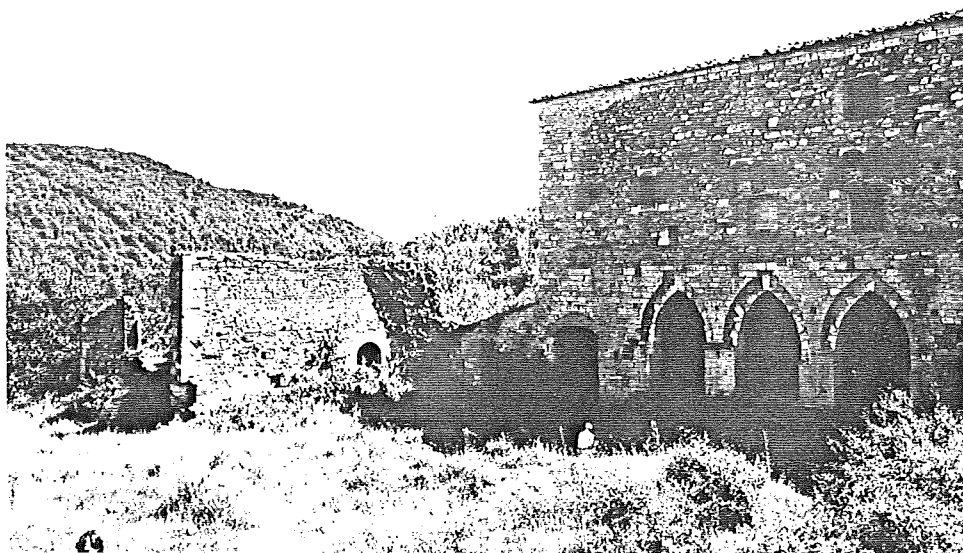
West facade of casa colonica and unidentified, fragmentary building attached at the northwest corner (Appendix C, BUILDING PLAN, No. 15).
